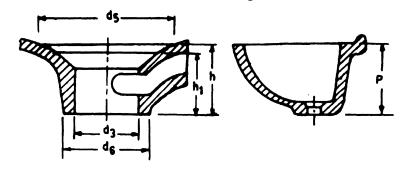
Connecting Dimensions for Single Tap Hole Wash Basins
